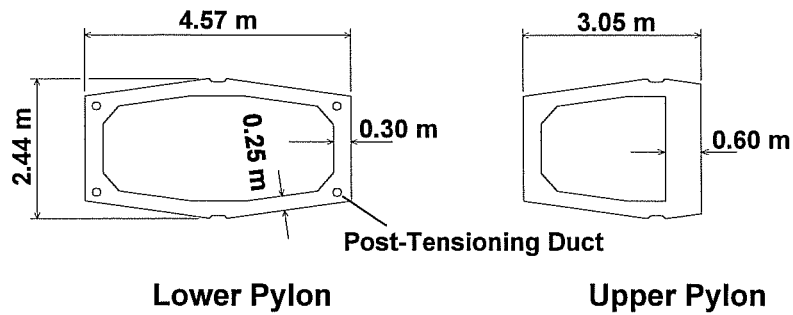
Segmental pylon cross-sections, Neches River Bridge.
